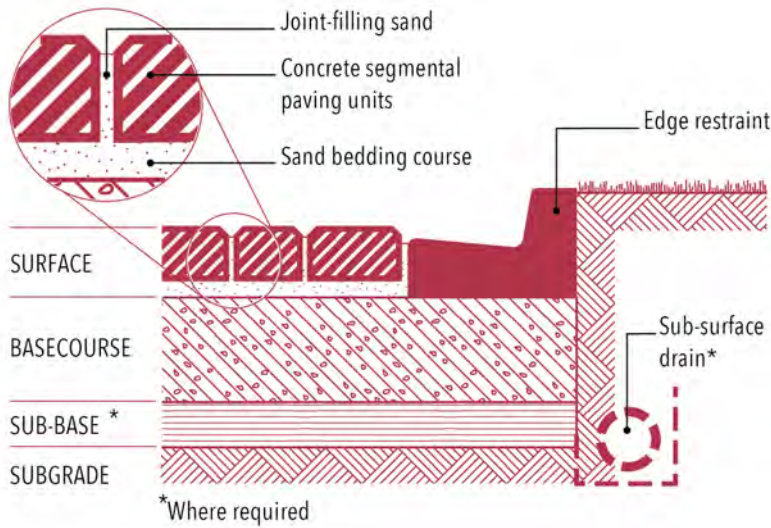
Typical cross section of a small-format concrete segmental pavement.
